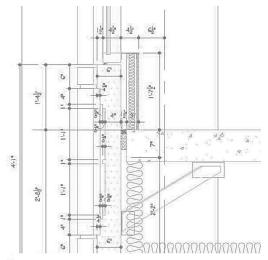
Wall Elevation Section - by Cagley and Assoc.
